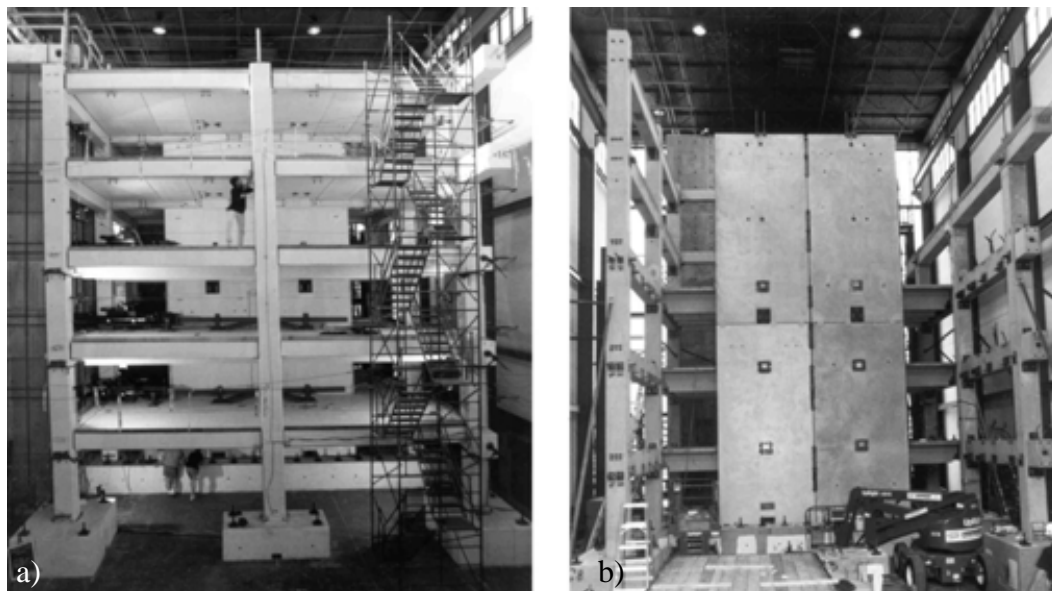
Five storey post-tensioned precast concrete building tested during the PRESSSS programme [169]:
